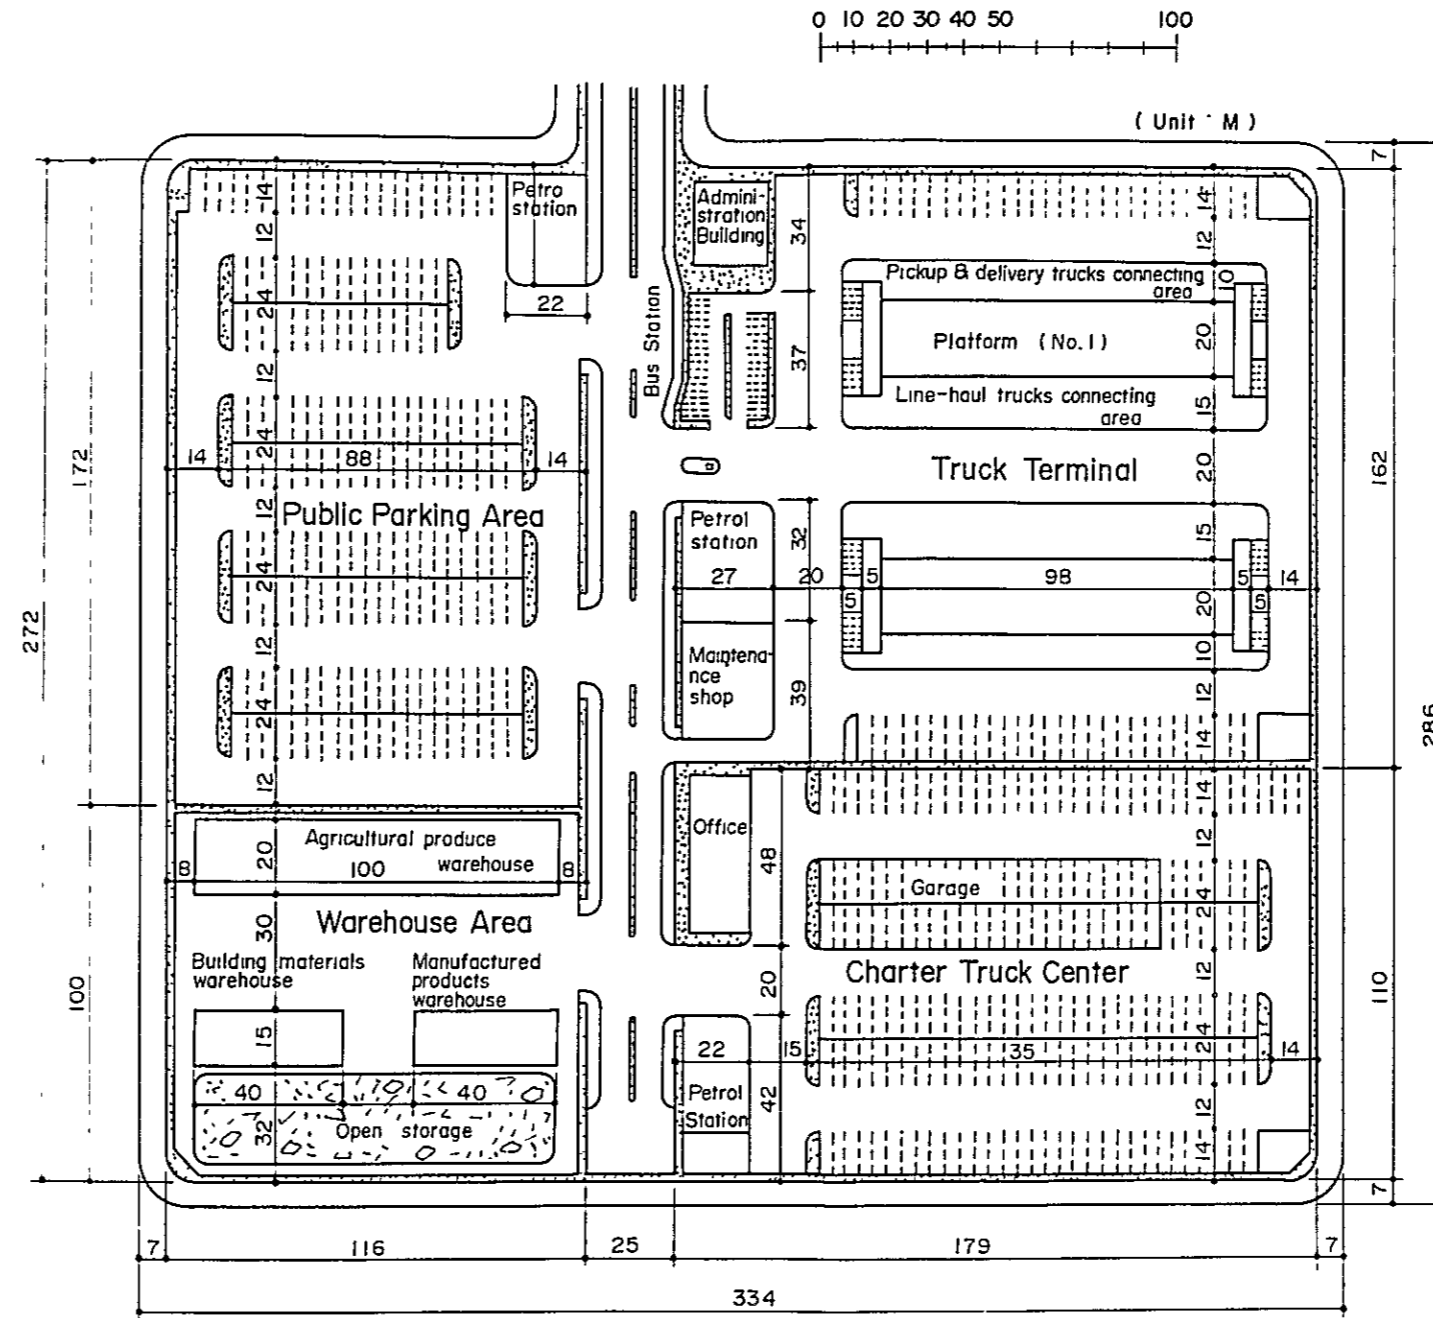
TERMINAL - W LAYOUT (Alt. 333)
